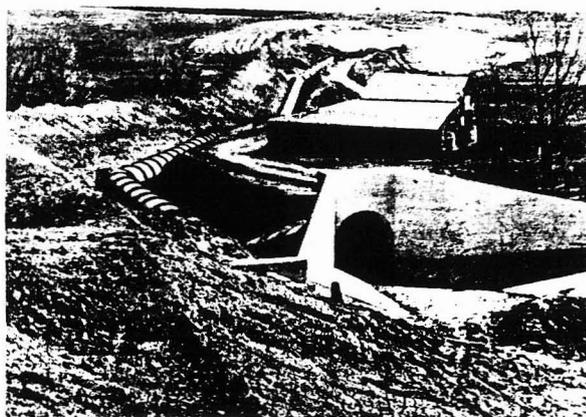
Inverted siphon inlet transition and 60-inch-diameter precast concrete pipe. P 499-700-520.
